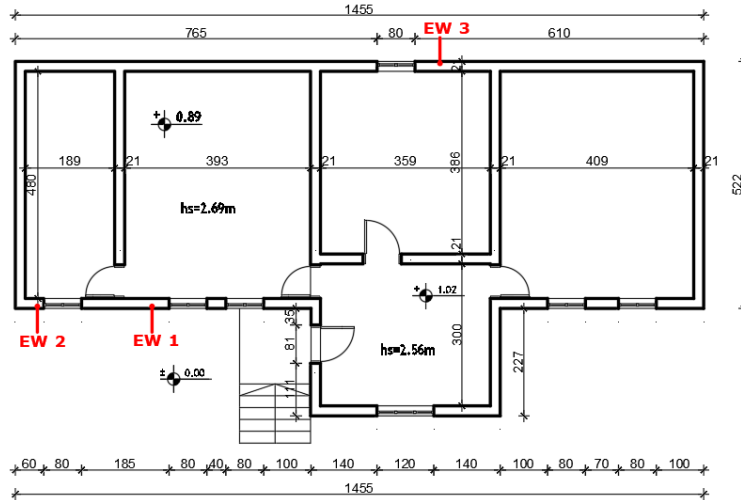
Plan of the house with marked measurement surfaces, source: authors
